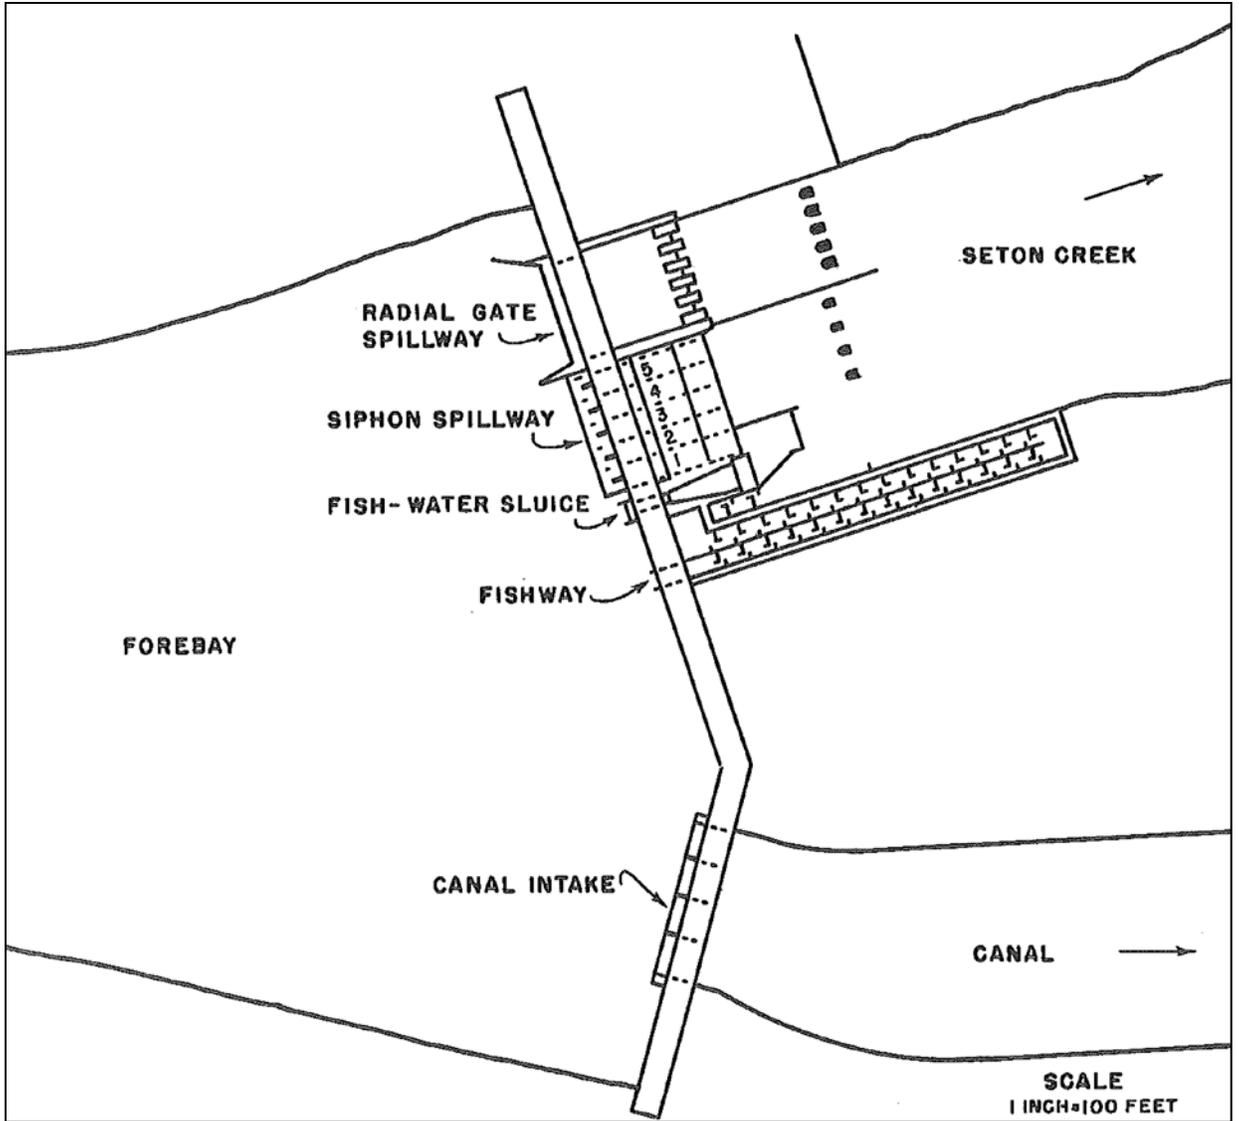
Plan view of Seton Dam (Andrew and Geen 1958).
